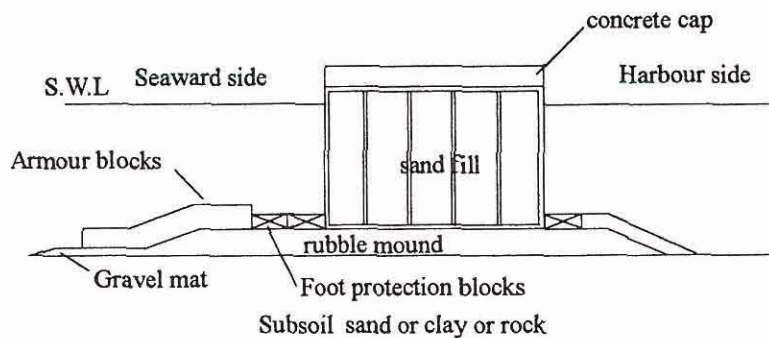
Typical cross section of a conventional vertical breakwater.
